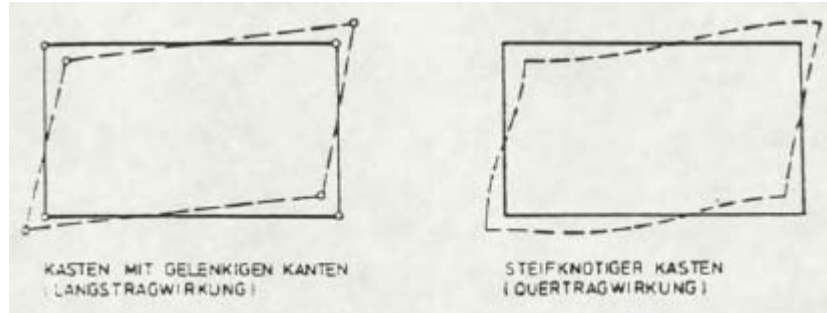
box girder cross-section model in longitudinal and transverse direction (Krebs & Lindlar, 1988).
